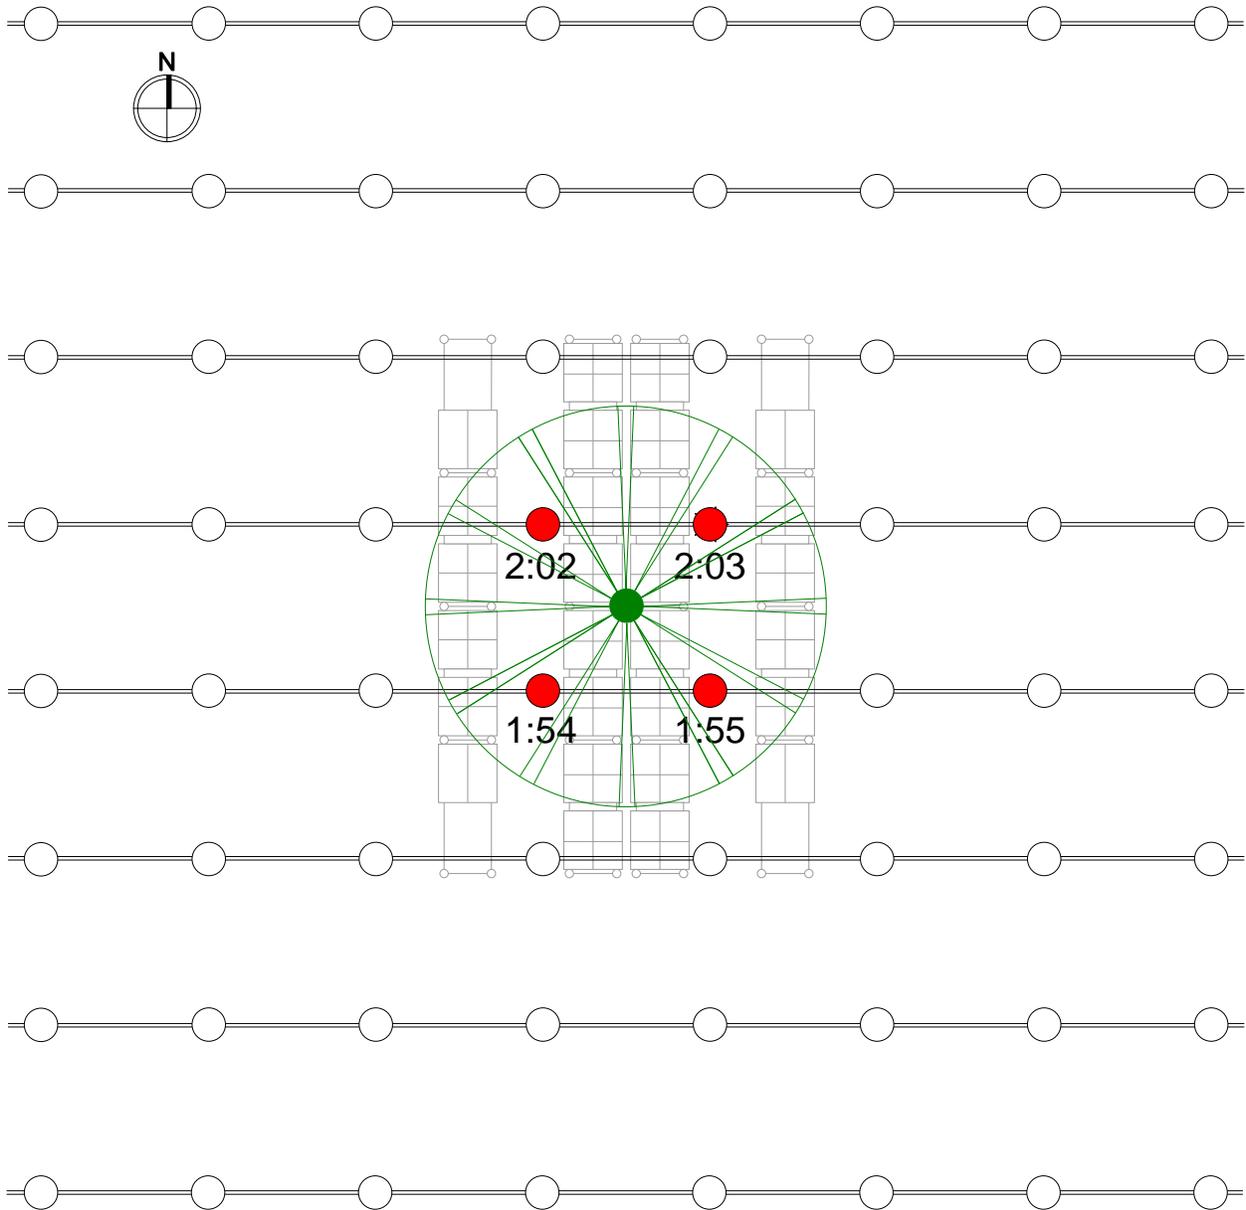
Plan view of sprinkler operation pattern - Test 3
